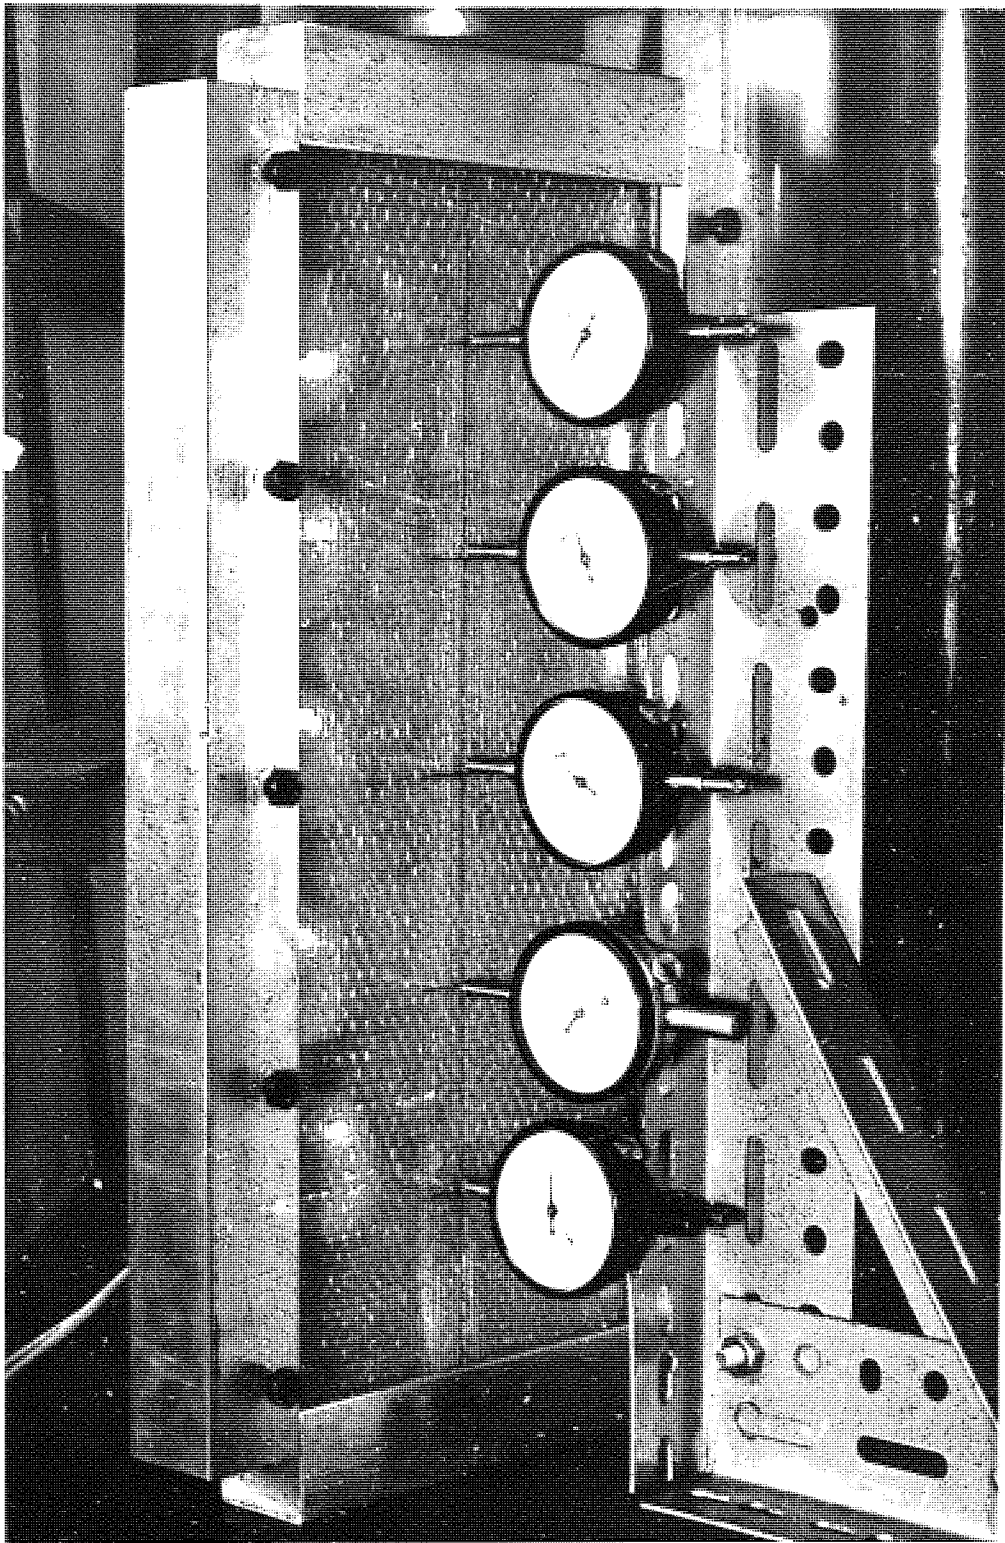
Plate under test view showing the supporting frame and the dial gauge positions
